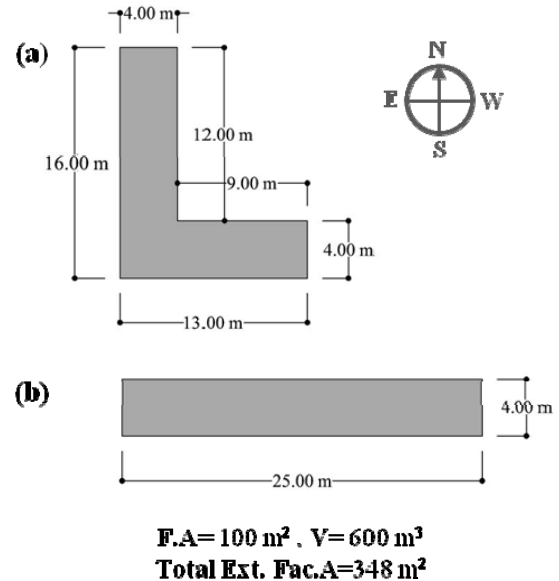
The dimensions, orientations, floor areas, the volumes and the exterior facade areas of the buildings used in application, (a) L shape, (b) Rectangular shape.
